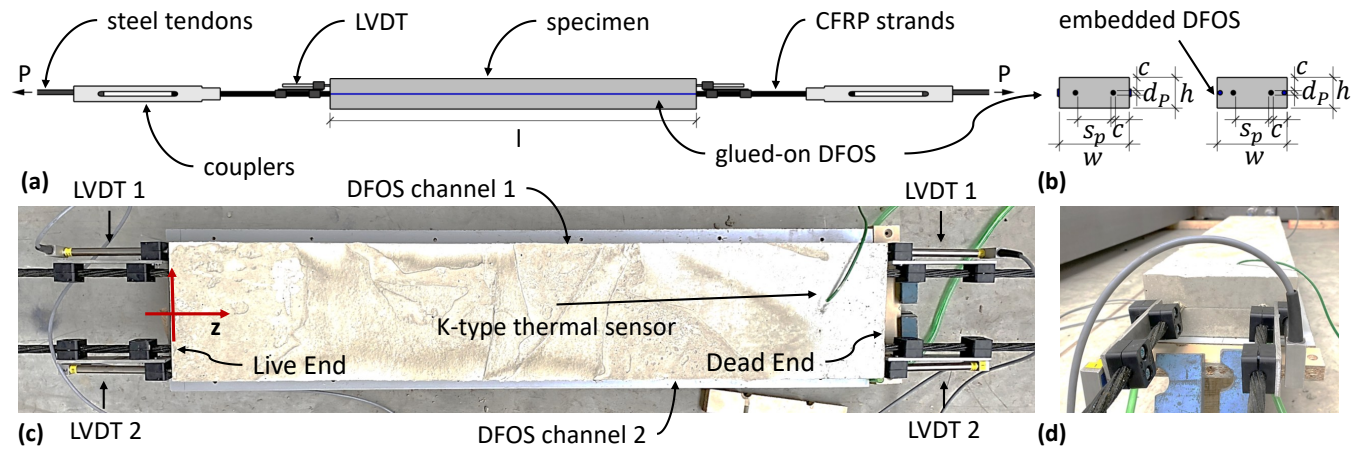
Test setup of the beam experiments: (a) Side view and (b) cross-sections (schematics); (c) Top view and (d) perspective view (photographs). Here, P denotes the prestressing force, l the specimen length, c the concrete cover, s_p the tendon spacing, d_p the tendon diameter, and w and h the cross-section width and height.
